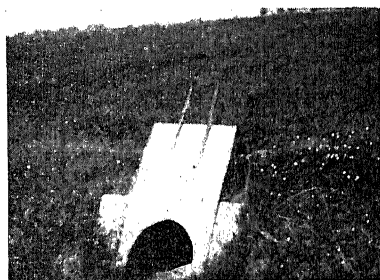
Concrete-pipe turnout with sloped head wall.
